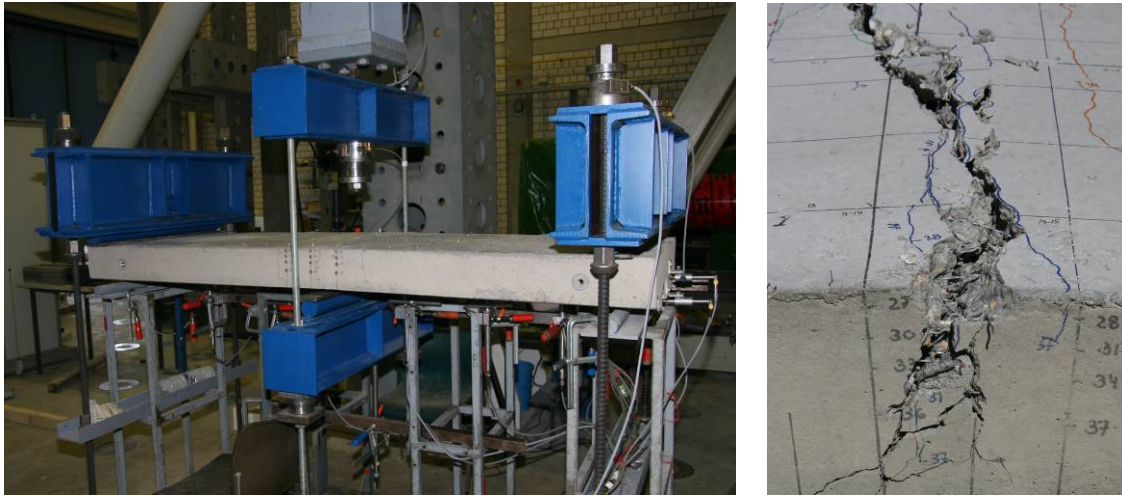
Test setup (left) and crack at ultimate limit state (right)
